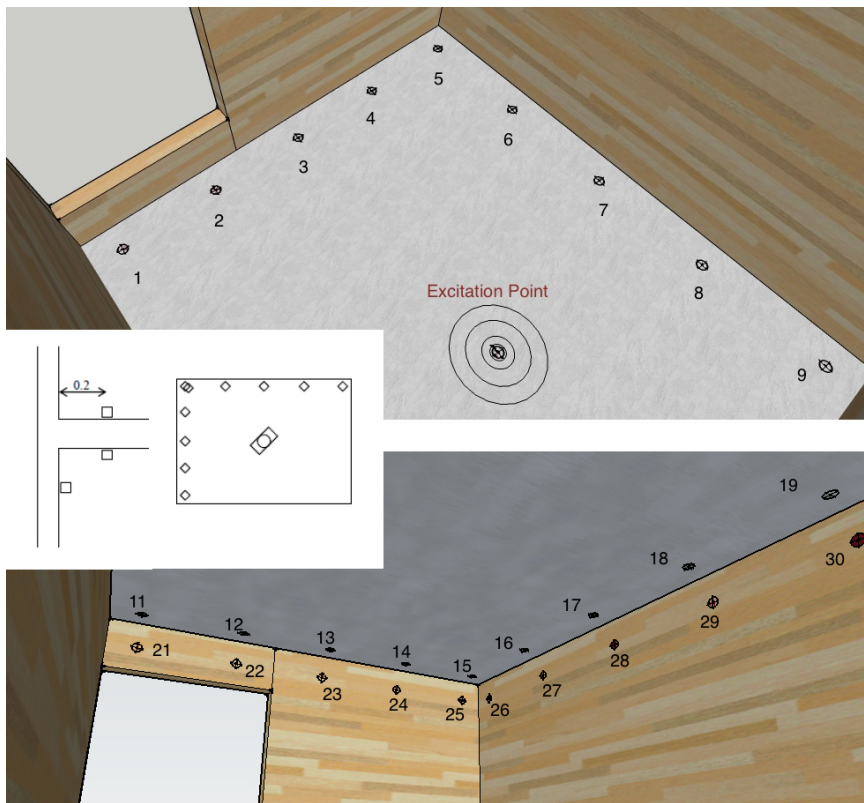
Measurement points on the test floor and the ceiling and walls below that (0.2m distance from the edges).
